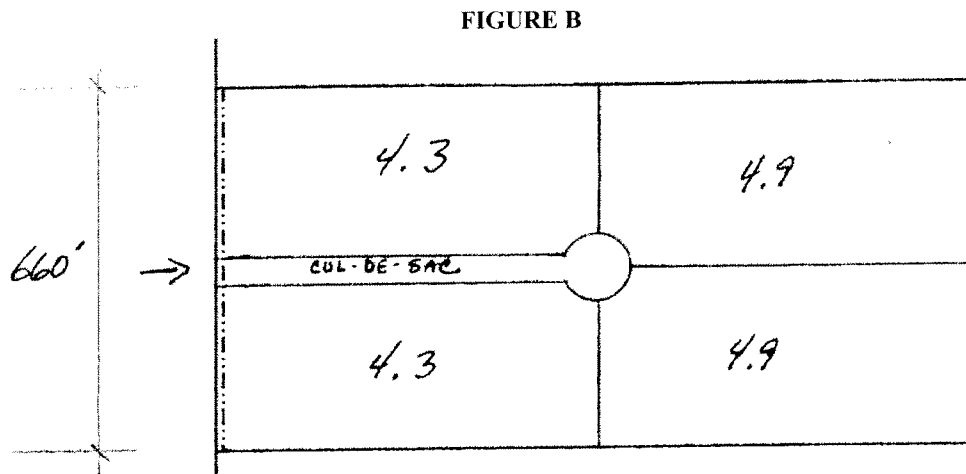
Figure B shows a revised layout of the proposed 4-lot RRO with a cul-de-sac providing lot access to all four lots.
